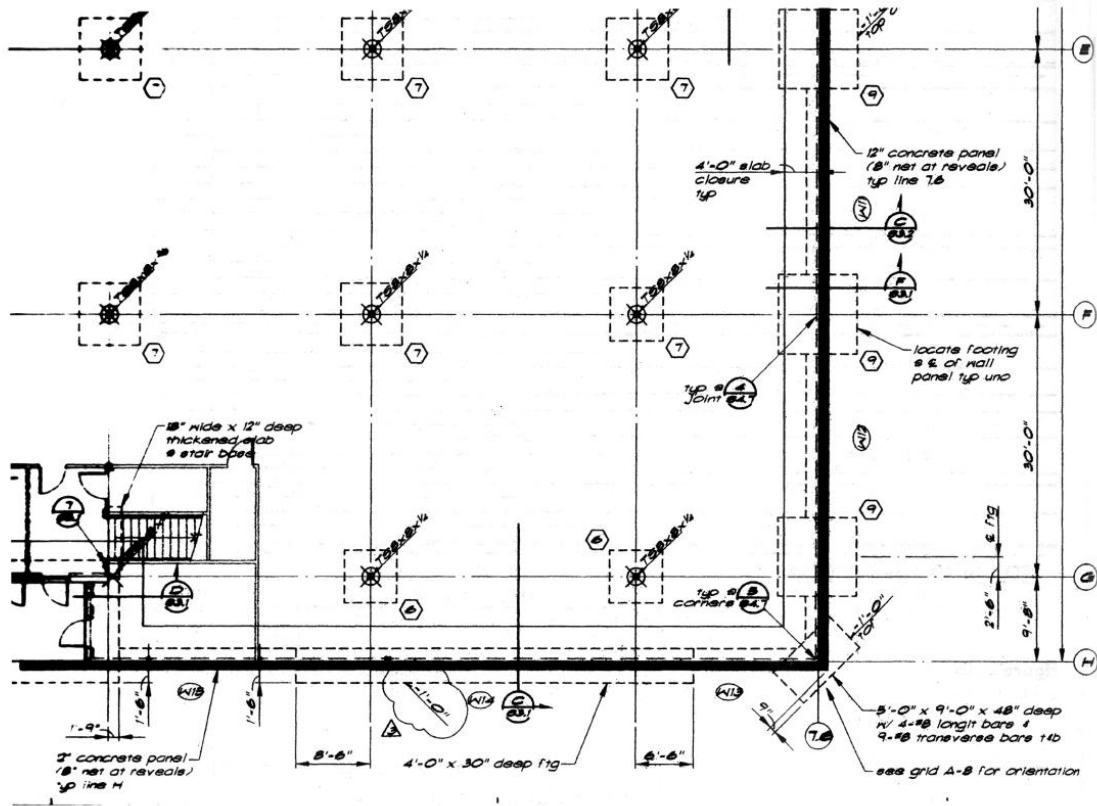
Drawings of structural steel framing systems begin with the foundation plan, which is where the columns and footings that carry the frame are described. (Drawing courtesy of Buehler and Buehler Structural Engineers.)
